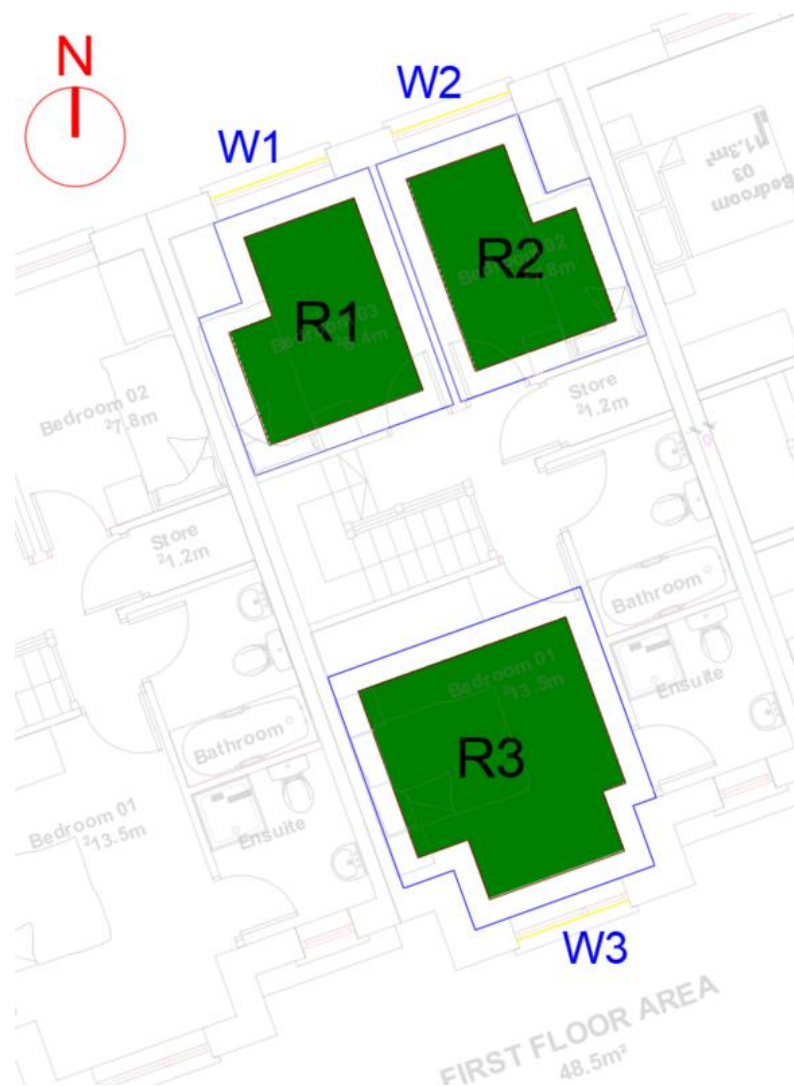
Proposed First Floor sDA Contours of House E-03 3-059
